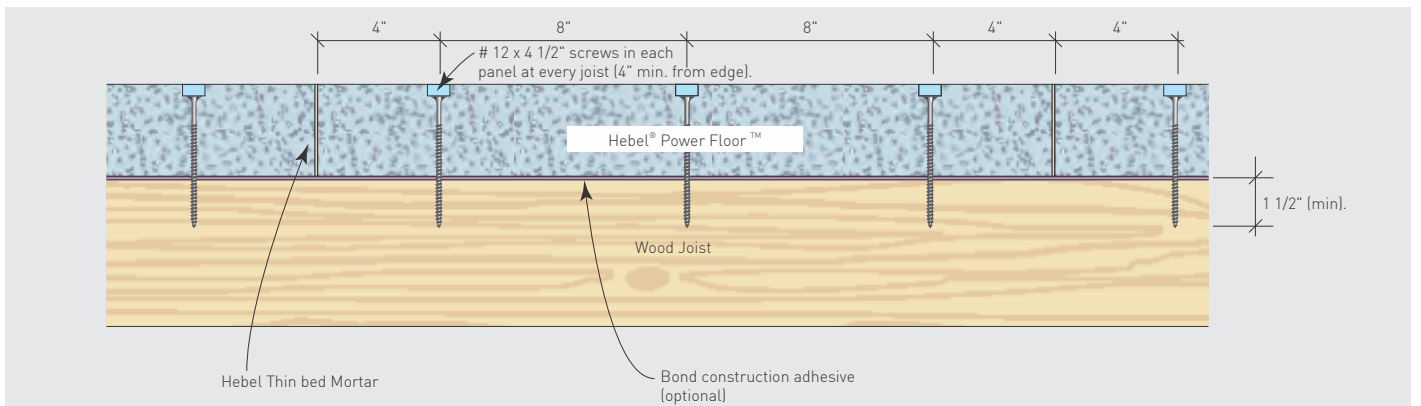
Cross-section of Hebel® PowerFloor™ Installation on Timber Joists.
